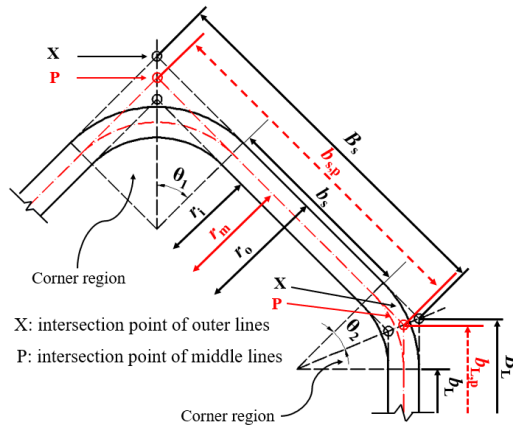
Detailed geometry and symbol definitions of the HSS cold-formed irregular hexagonal hollow section.
